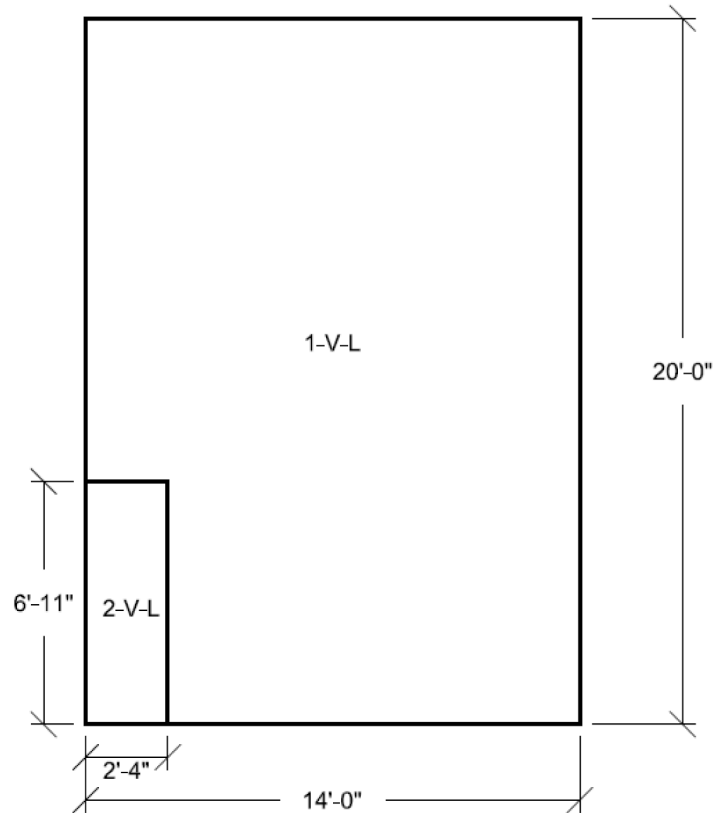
H.6-176A DGFOSV Wall 9 Looking From Outside Vertical Reinforcement Zone Far Side Face
